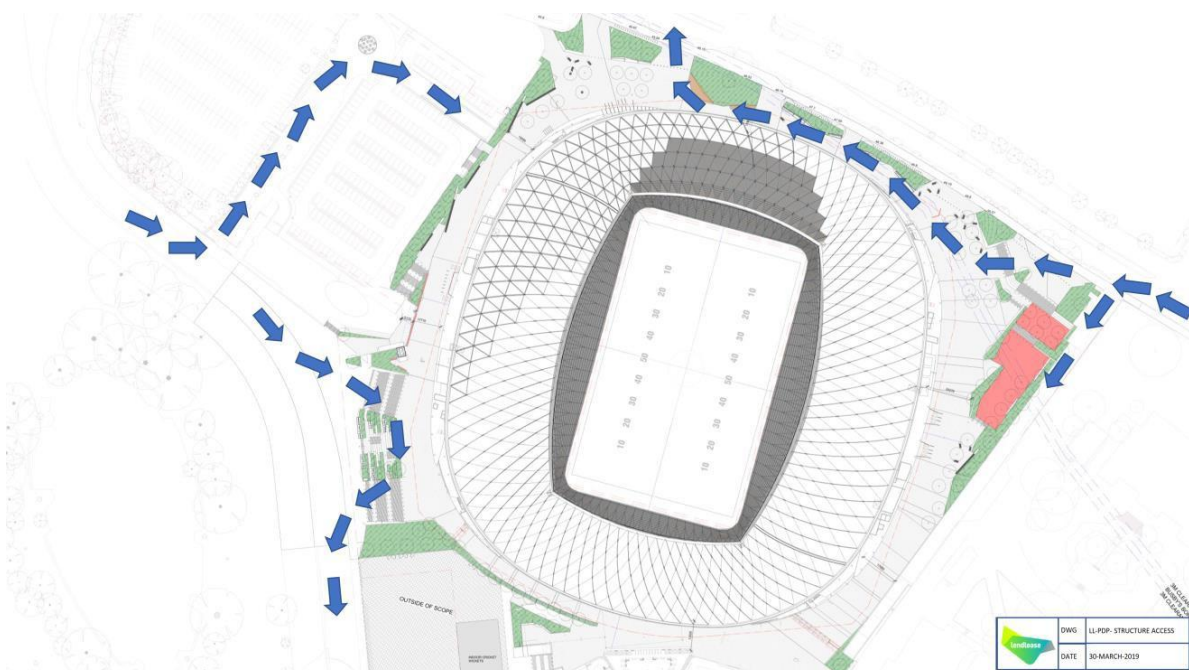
Stage 1b Stadium Structure, Façade and Roofing
